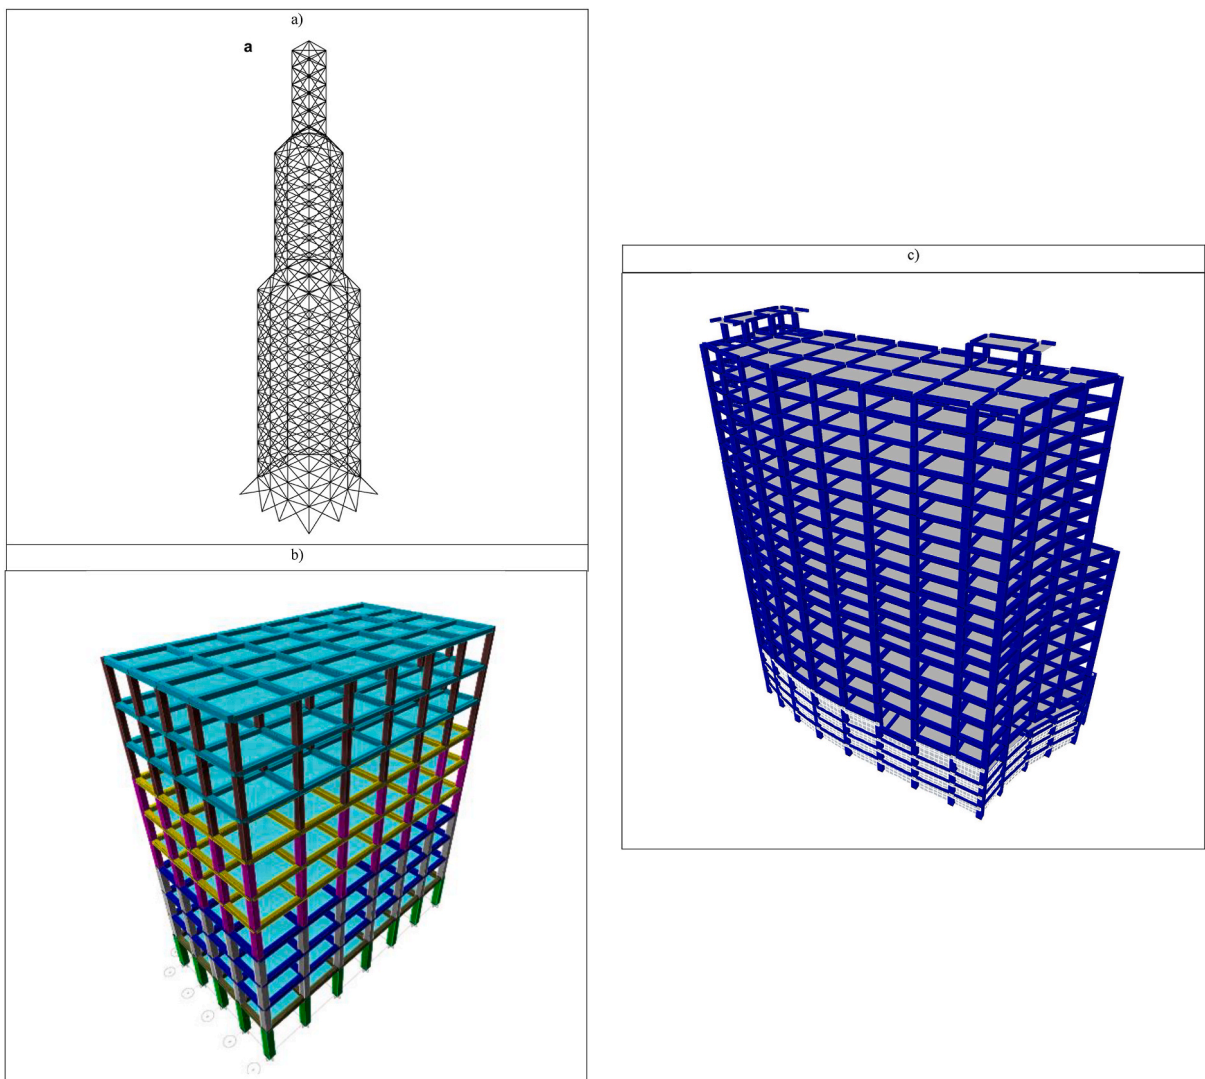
3D view of the structures: a) 26-story tower spatial truss structure, b) 10-story concrete building, c) 22-story steel building.
